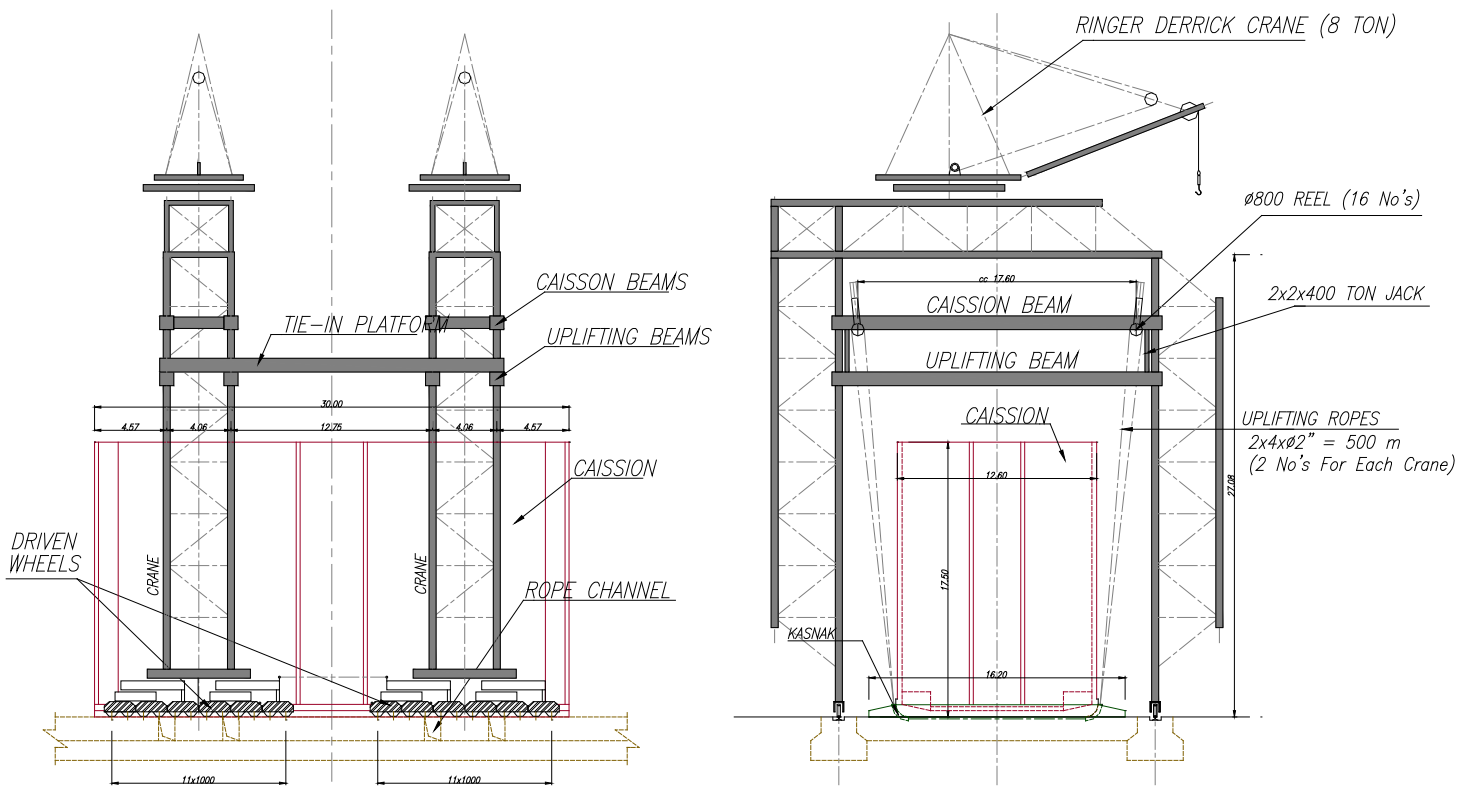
Plan and Section Drawings of the Caisson and the DEVE Heavy Crane
